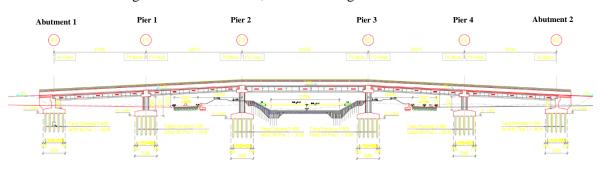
Typical longitudinal section of Bridge 1 & Bridge 4.
